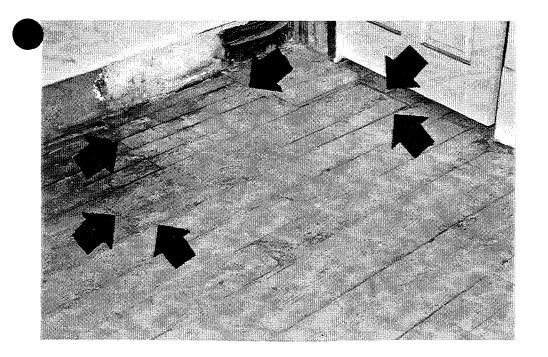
SUB-FLOOR AT ROOM 104
